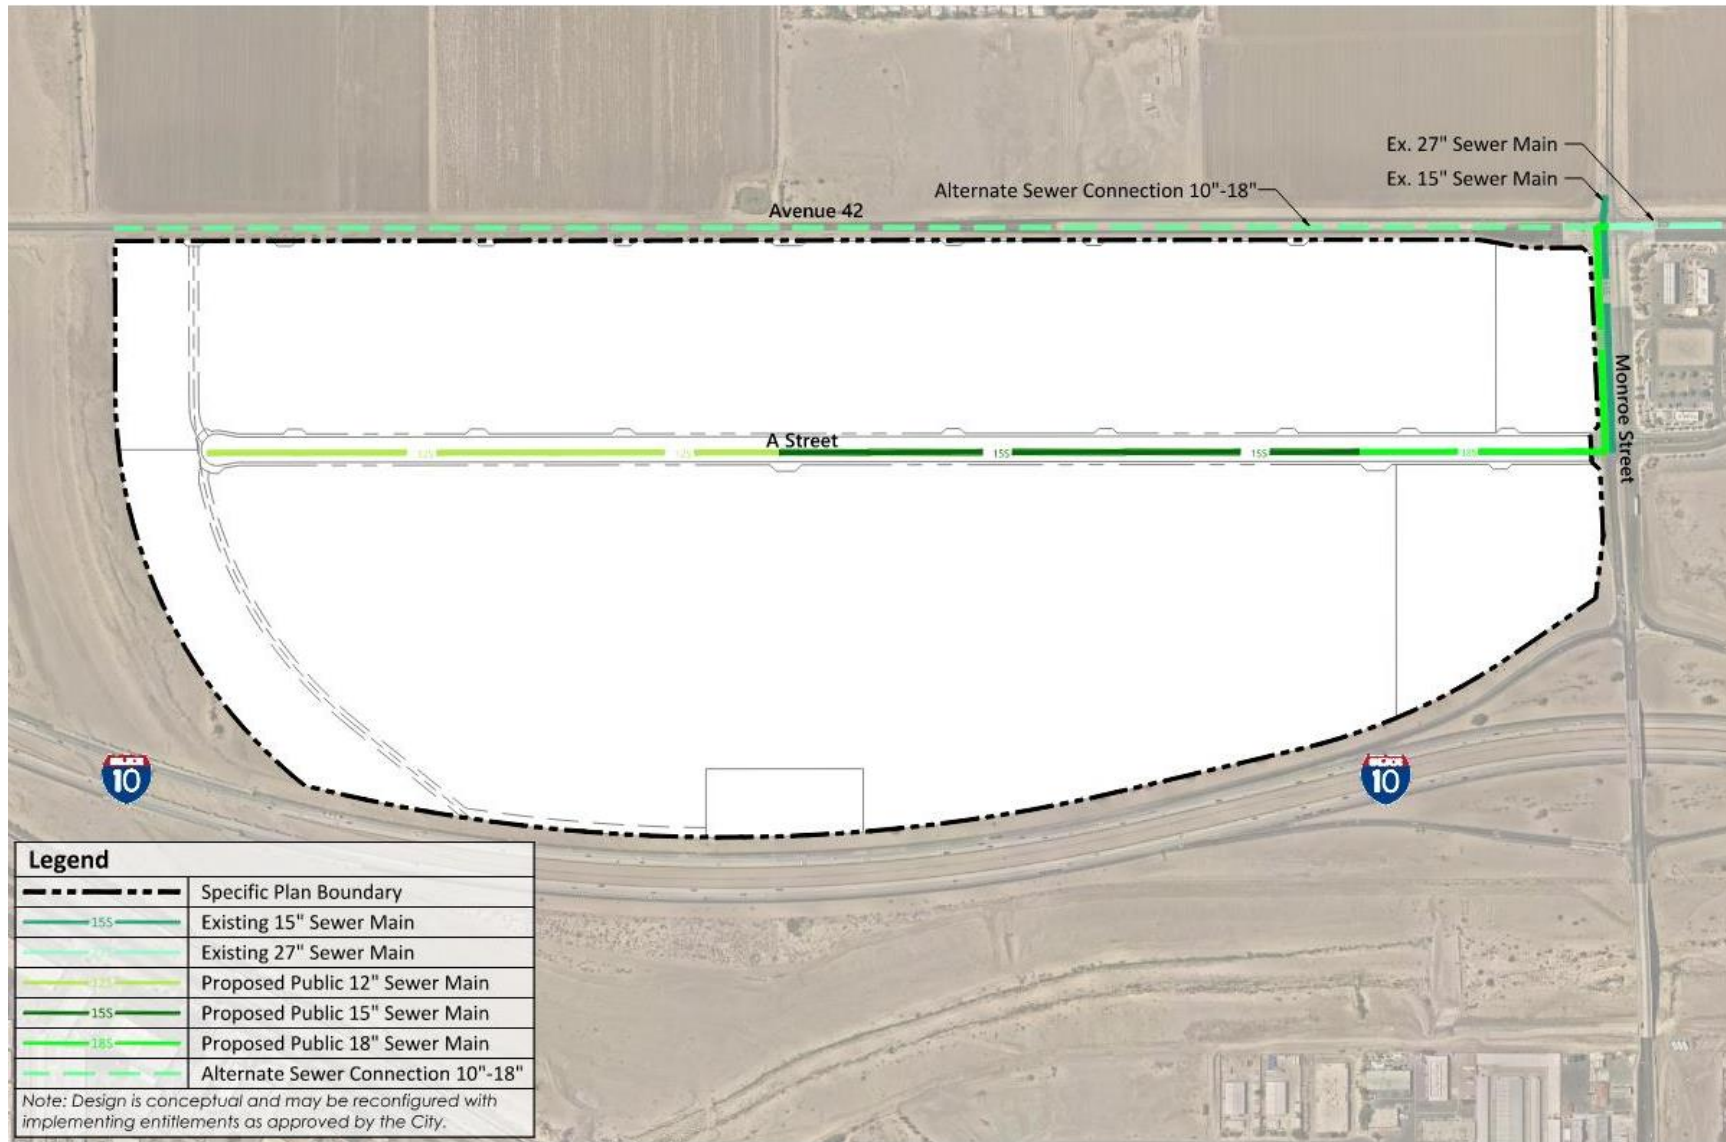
Conceptual Sanitary Sewer Infrastructure Plan
